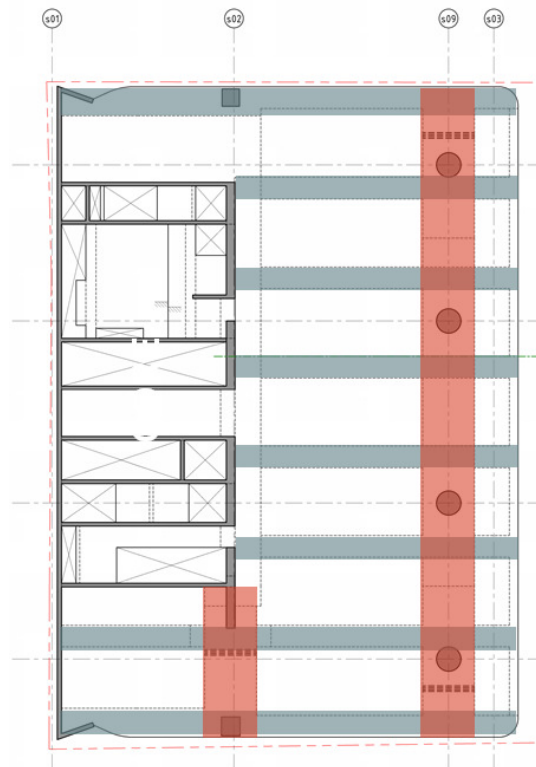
Typical primary and secondary beams on a high rise floor plate.
